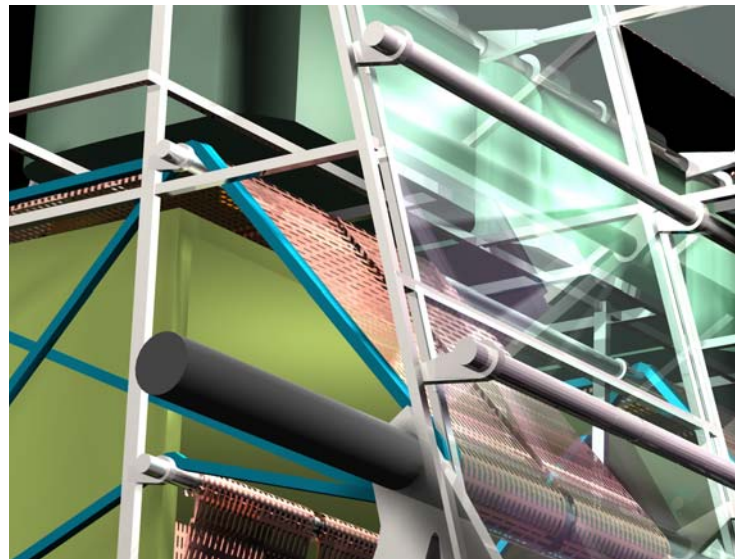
Digital Wall Section Detail Close Up, by Sergio Ramirez.
